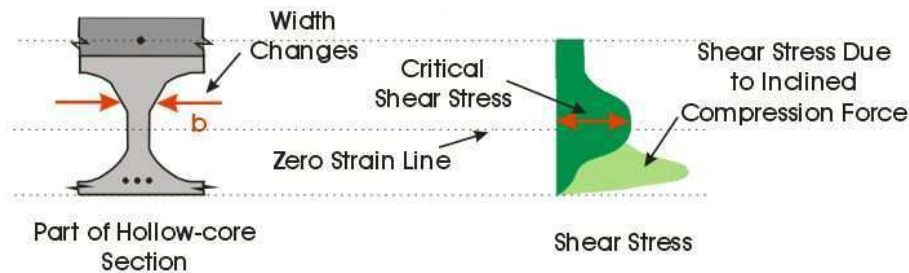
Shear stress between flexural cracks in a hollow-core floor section
